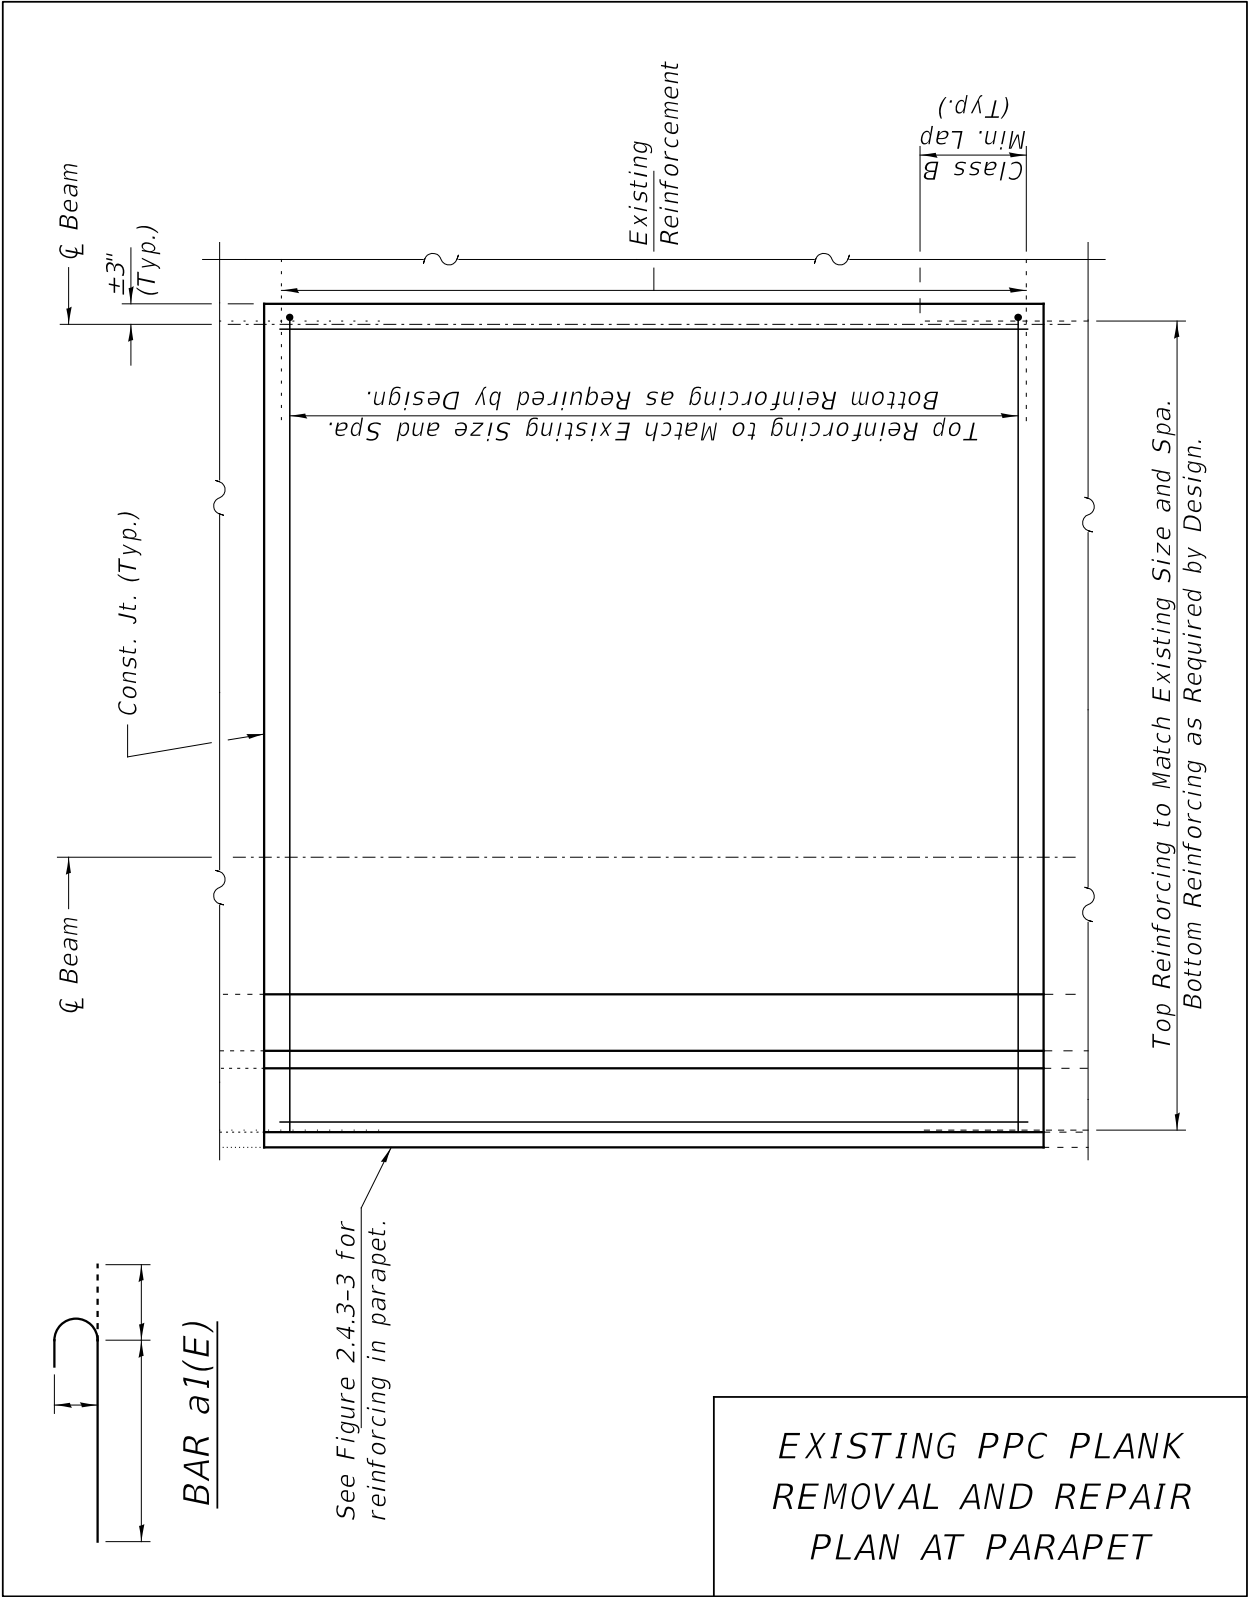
Existing PPC Plank Removal and Repair Plan at Parapet
